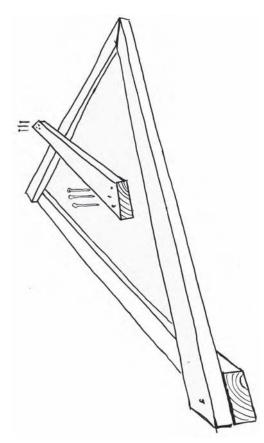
Installation of a collar tie to the sides of a pair of rafters in a coupled roof
